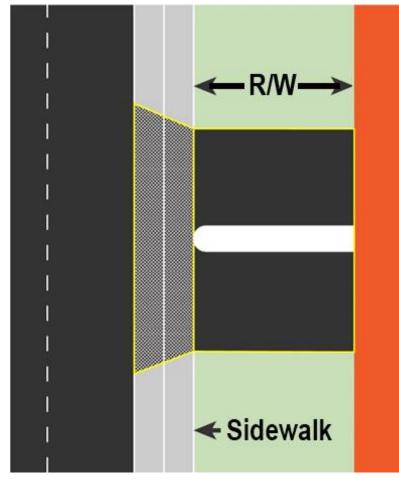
| Limits of Construction and Maintenance for Flush Shoulder "Rural" Section Connections
